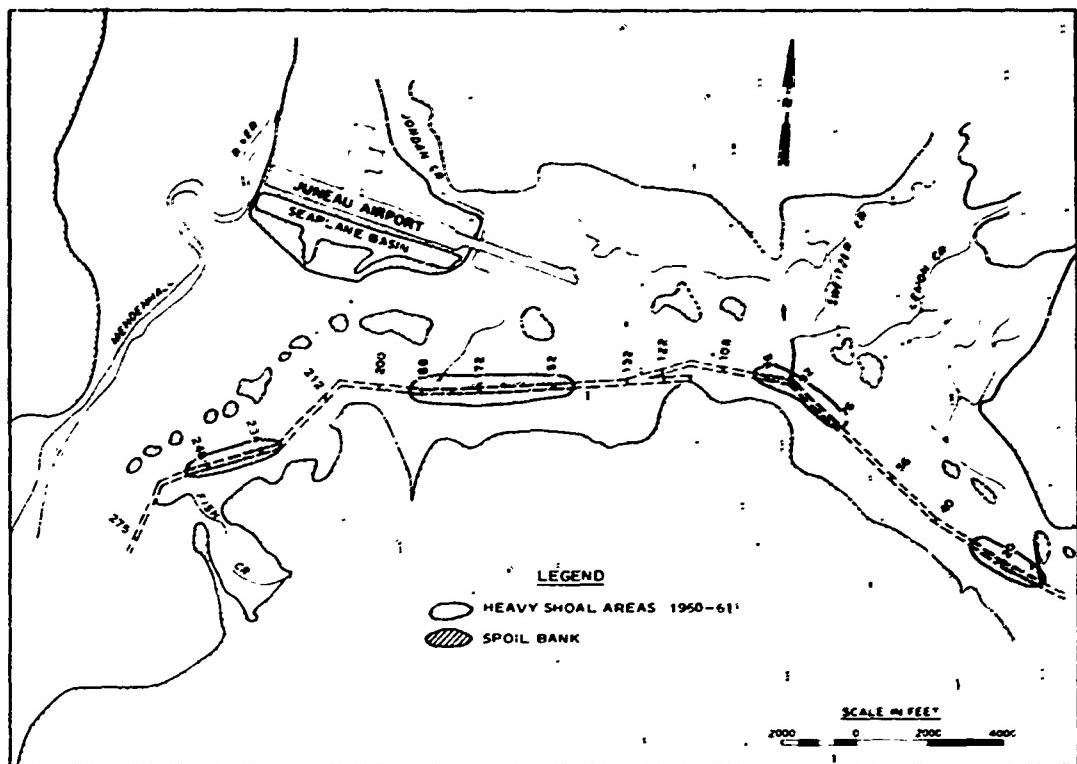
Location of cross sections and heavy shoal areas (1960-61)
